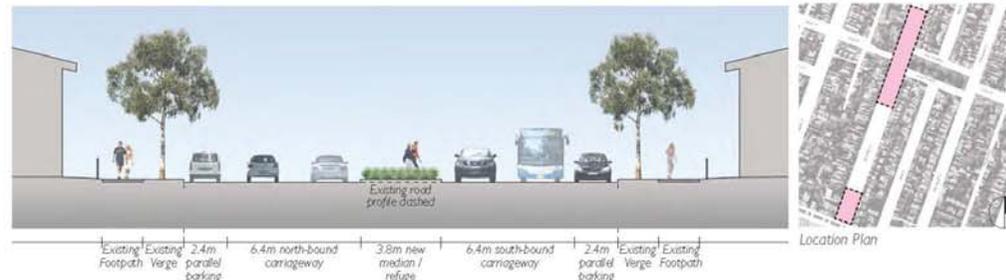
TYPICAL SECTION STREETScape TYPE 1 - PARALLEL PARKING BOTH SIDES, 1:200 @A3
